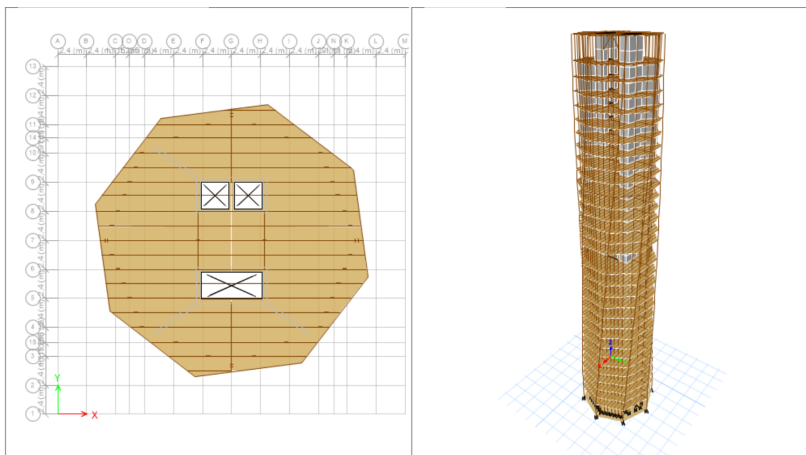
Plan section and 3D view of octagon twisting and tapered model
